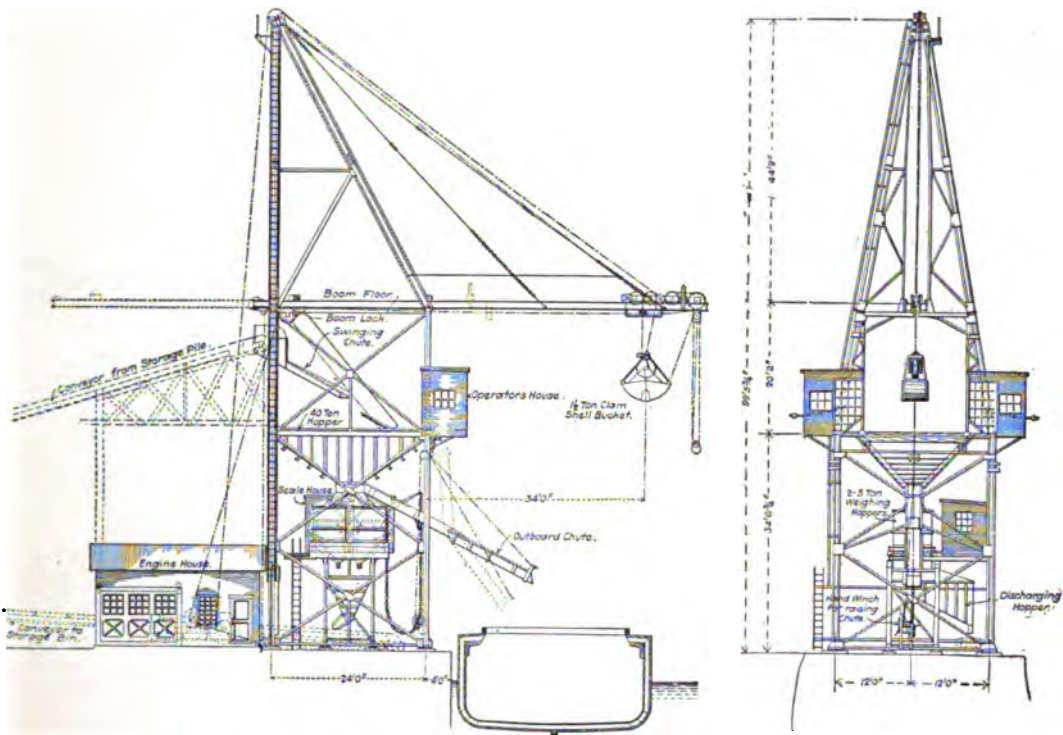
Steeple Loading and Unloading Tower with Weighing Hopper, Shady Side Coal Storage Plant of the New York Edison Co. (*Engineering Record*).
